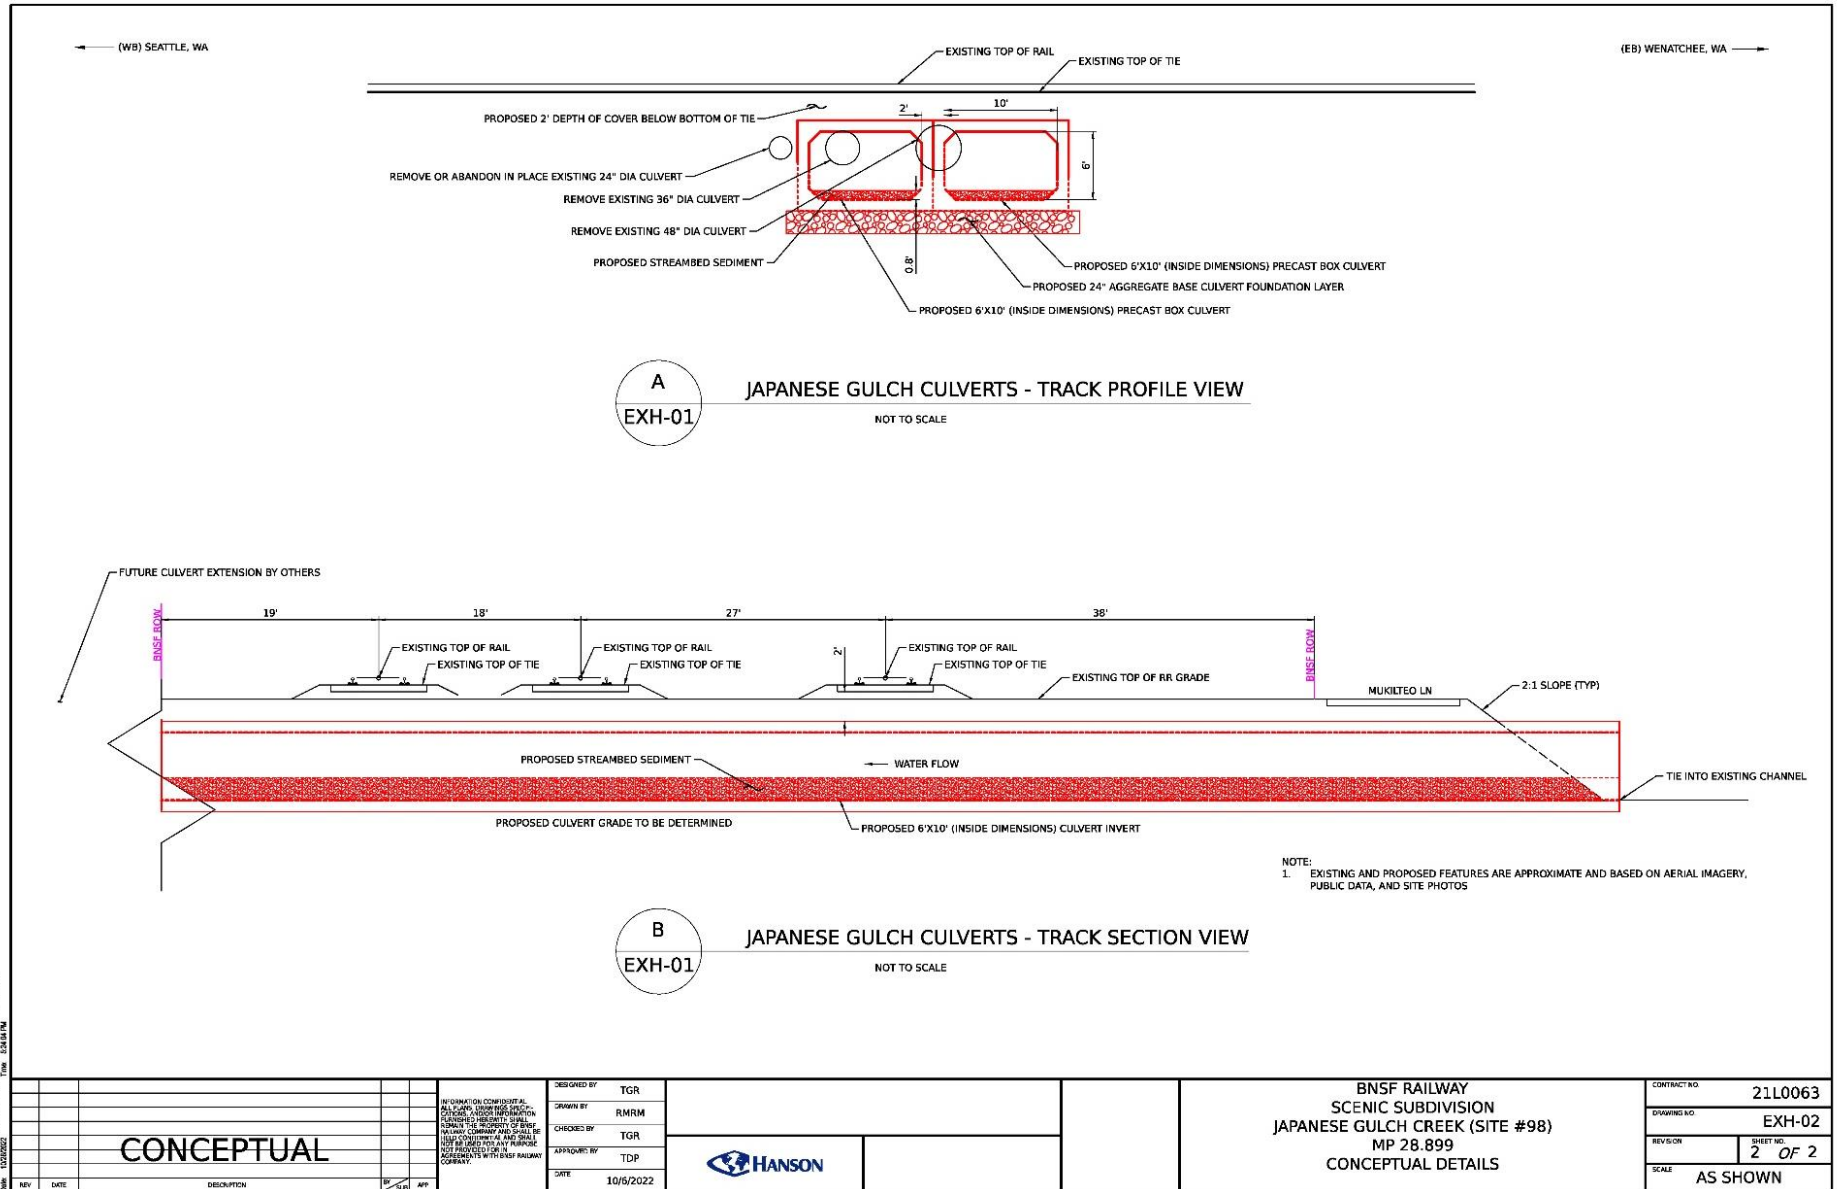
Conceptual Engineering Profile and Section of Replacement Culverts Under Railroad Tracks at Japanese Gulch Creek
